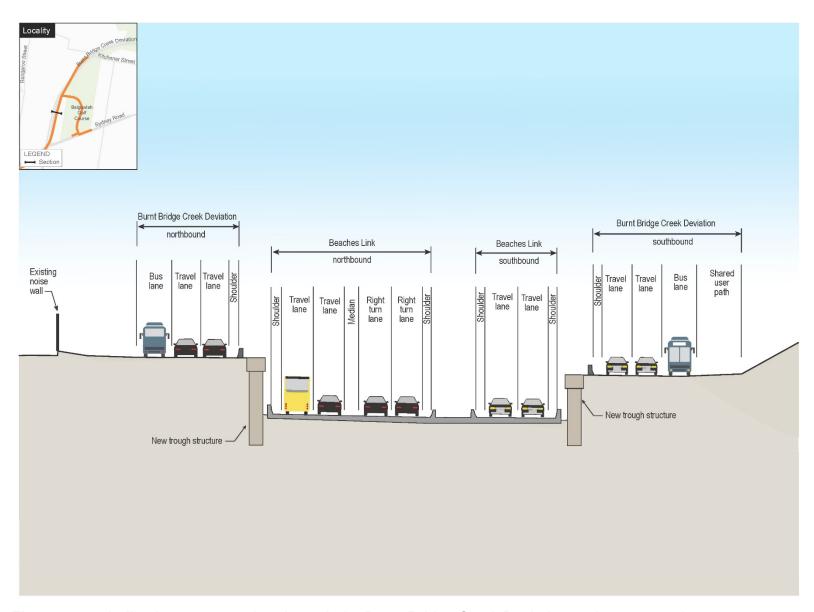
Indicative cross-section through the Burnt Bridge Creek Deviation and ramp trough structures
